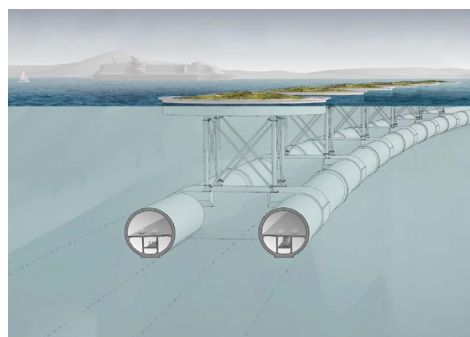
Submerged floating tunnel, supported by pontoons, as in 2016.
